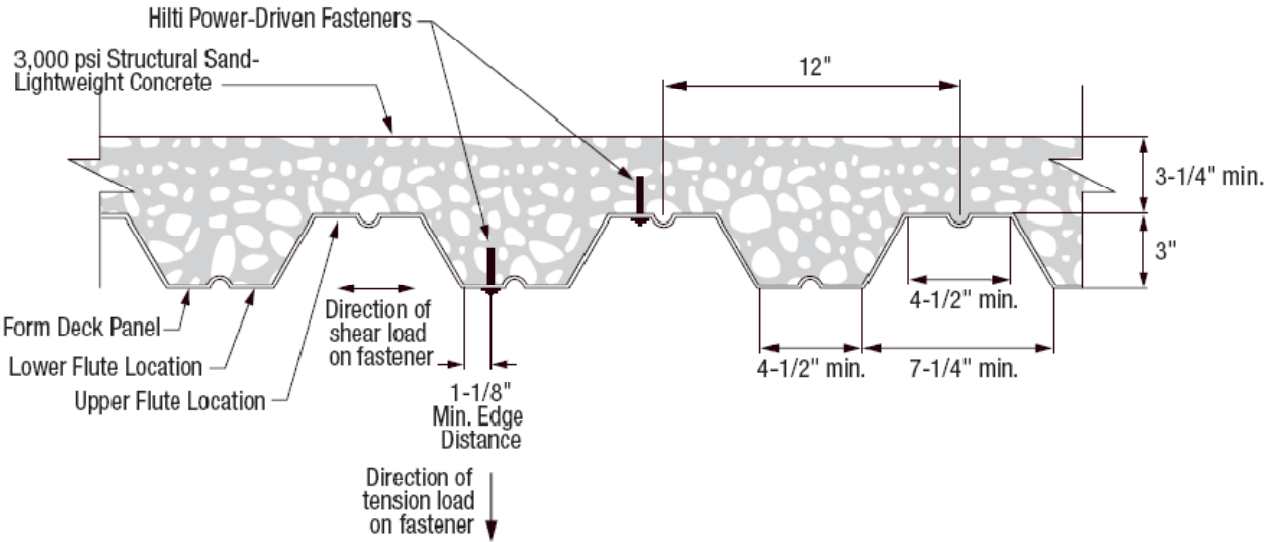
HILTI FASTENER LOCATIONS IN 3-INCH-DEEP COMPOSITE FLOOR DECK PANEL
